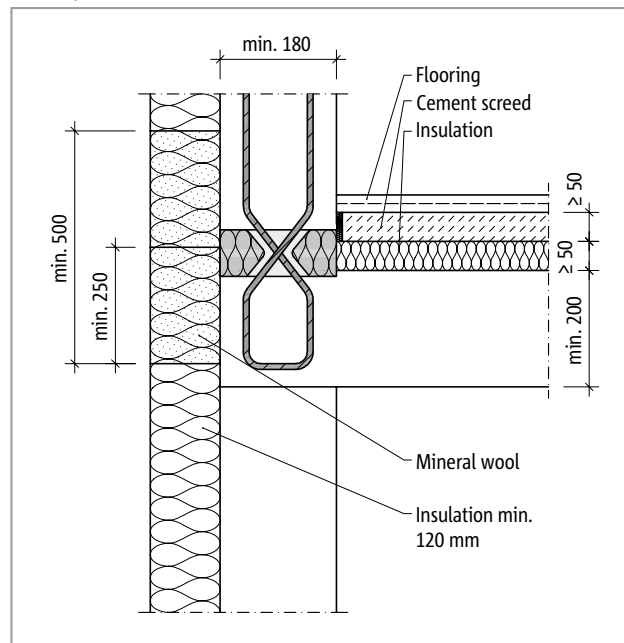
Schöck Sconnex® type W: R 120 / EI 120 with external wall and above-slab insulation
